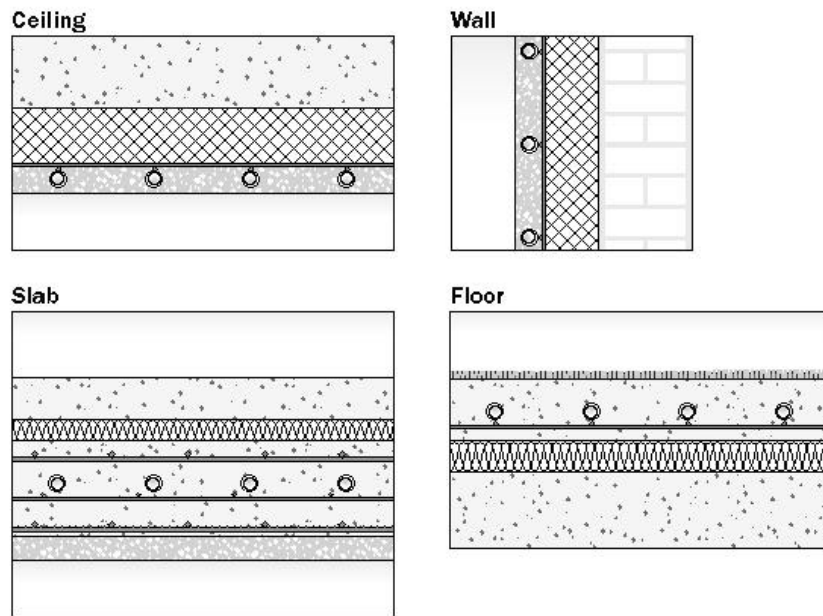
Examples of the positioning of pipes in floor, wall, ceiling and slab constructions.
